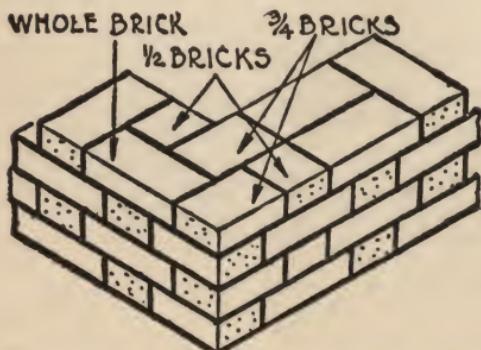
,234.—Outside and inside corners in garden wall bond, 8 and 12 in. walls.
